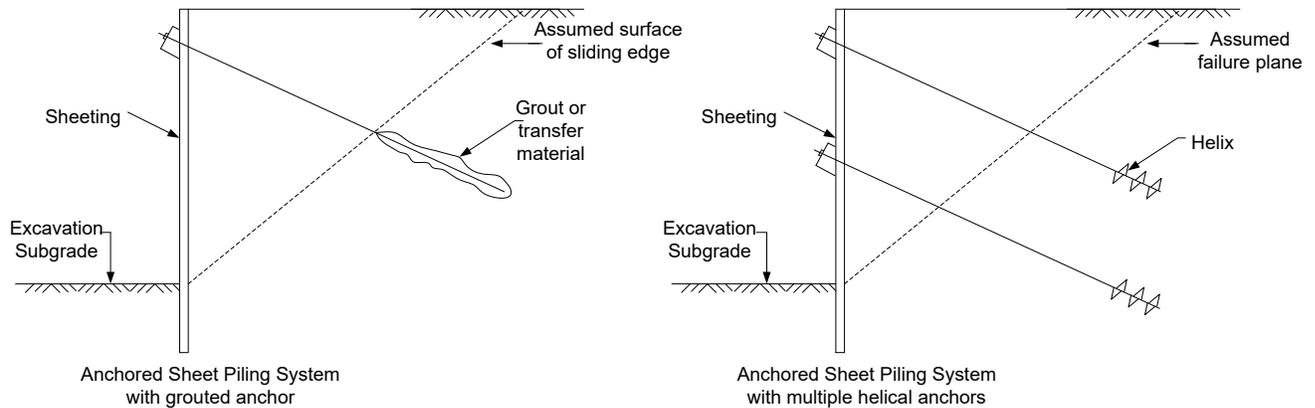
Anchored sheet pile earth retaining wall systems.
